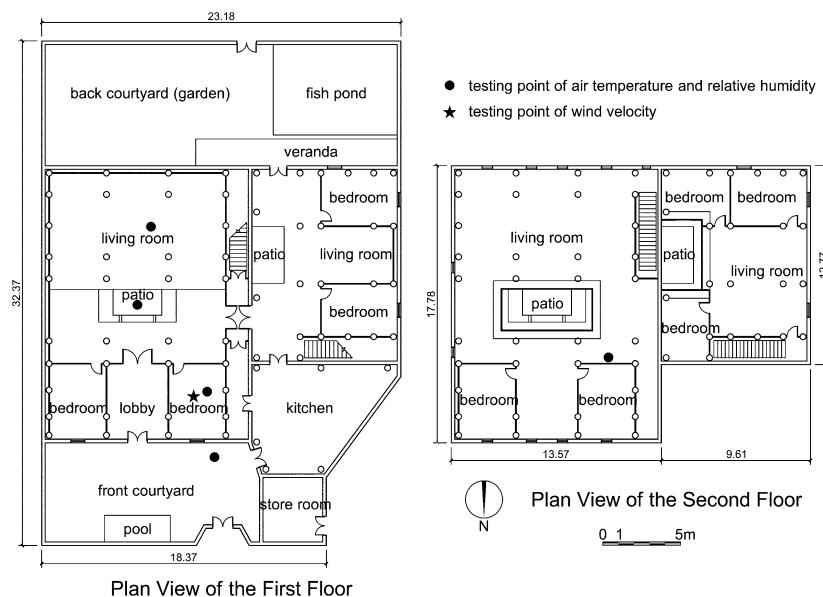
Plan view of the typical traditional dwelling and the distribution of testing points.
